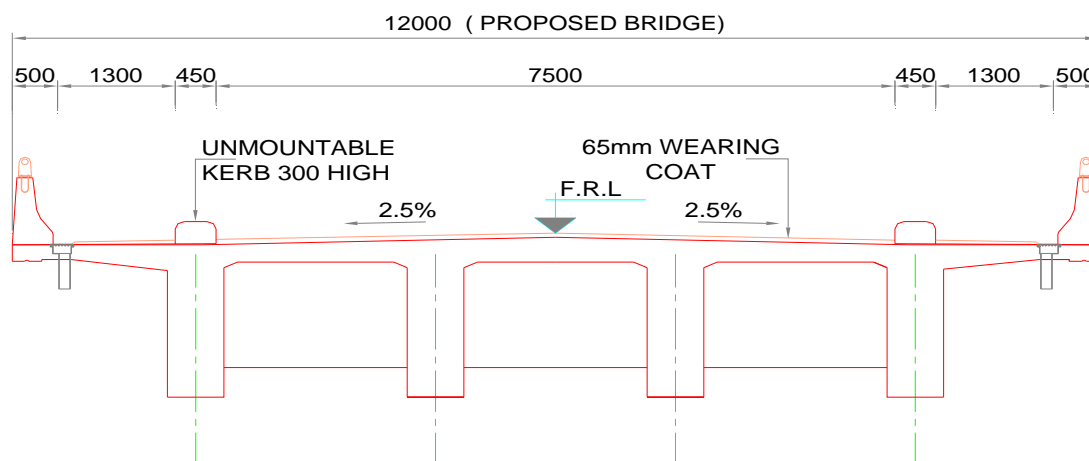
TYPICAL CROSS SECTION- TYPE-0
